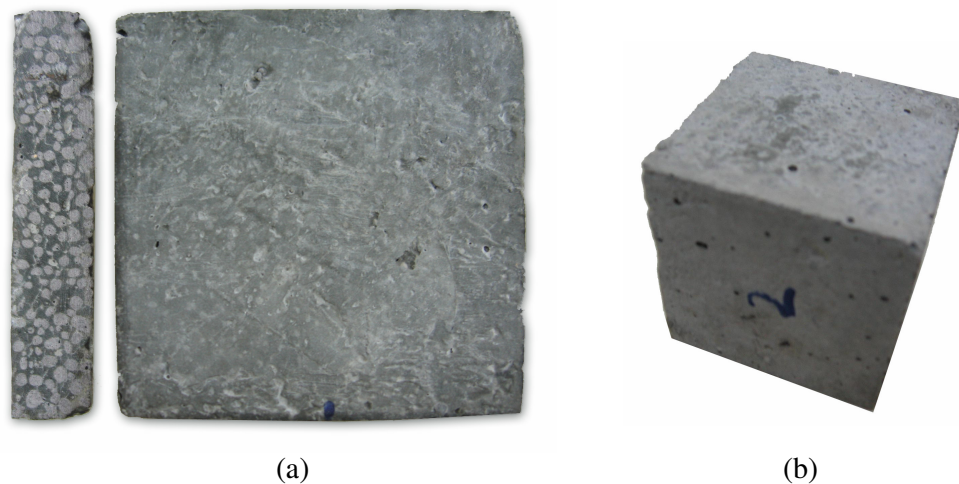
(a) Block concrete sample, (b) Cubic sample made with lightweight aggregates
